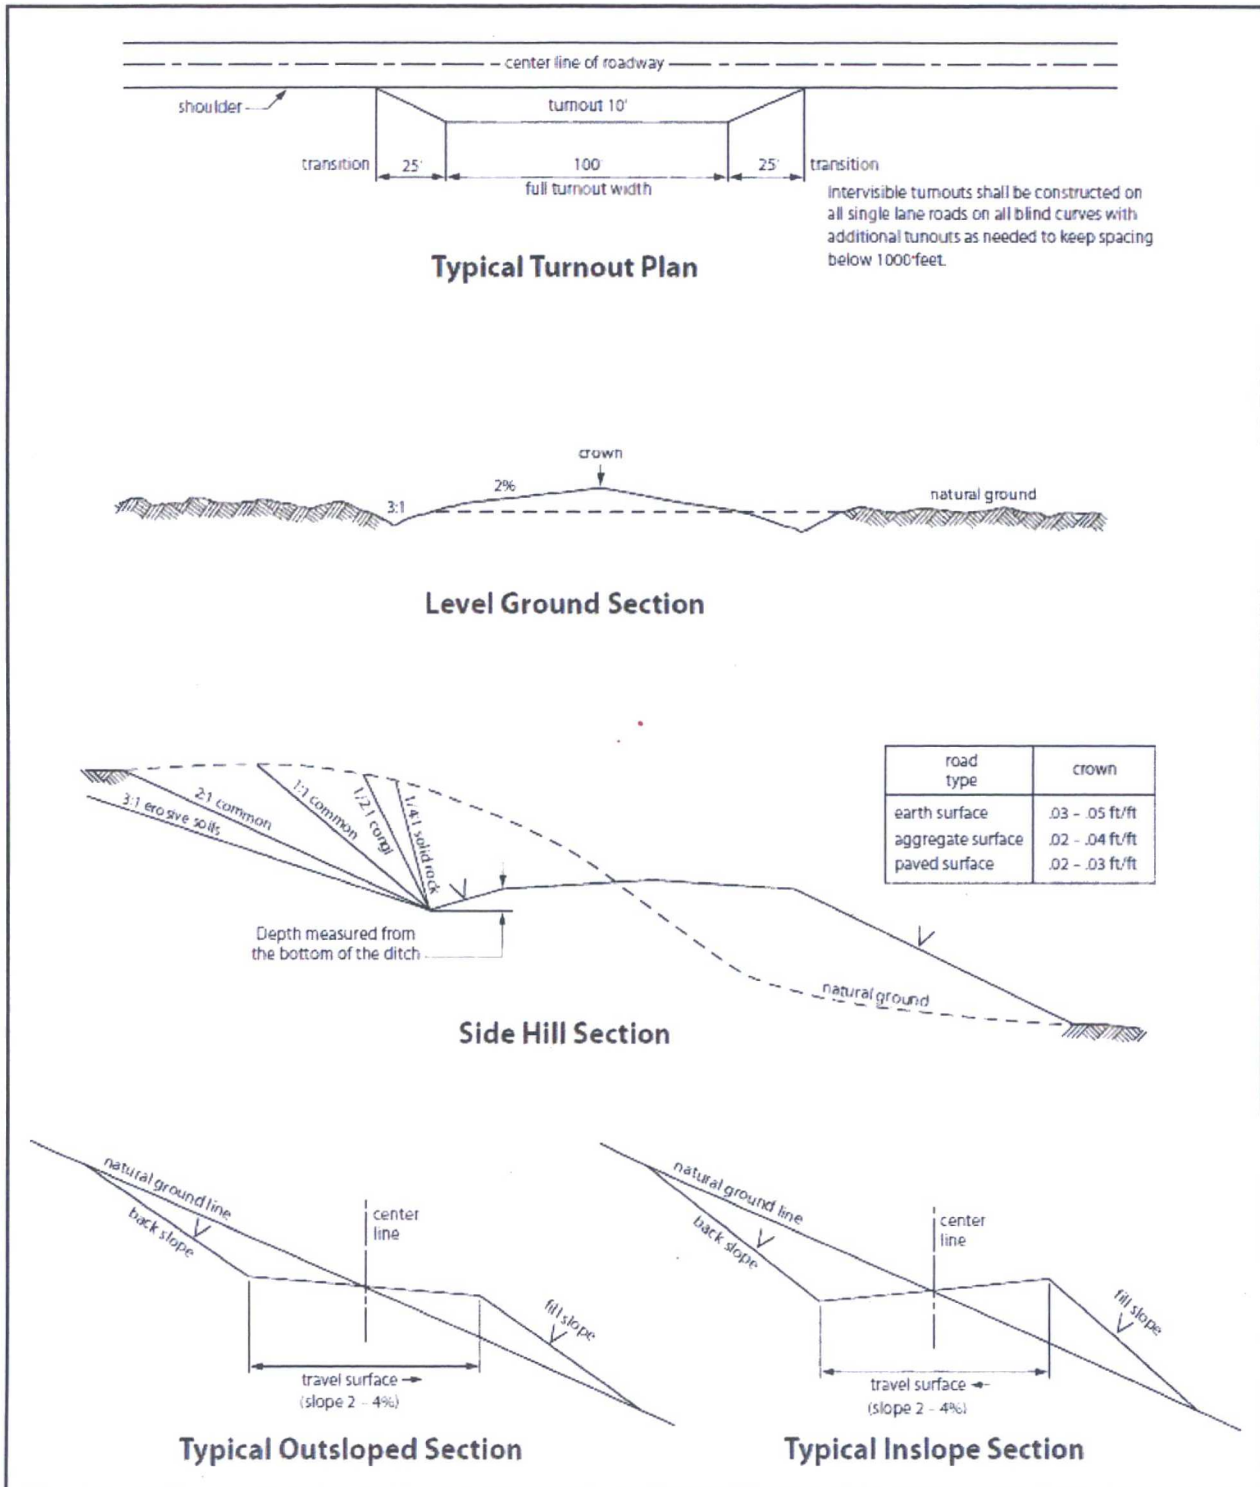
Cross-sections and plans for typical road sections representative of BLM resource or FS local and higher-class roads.
